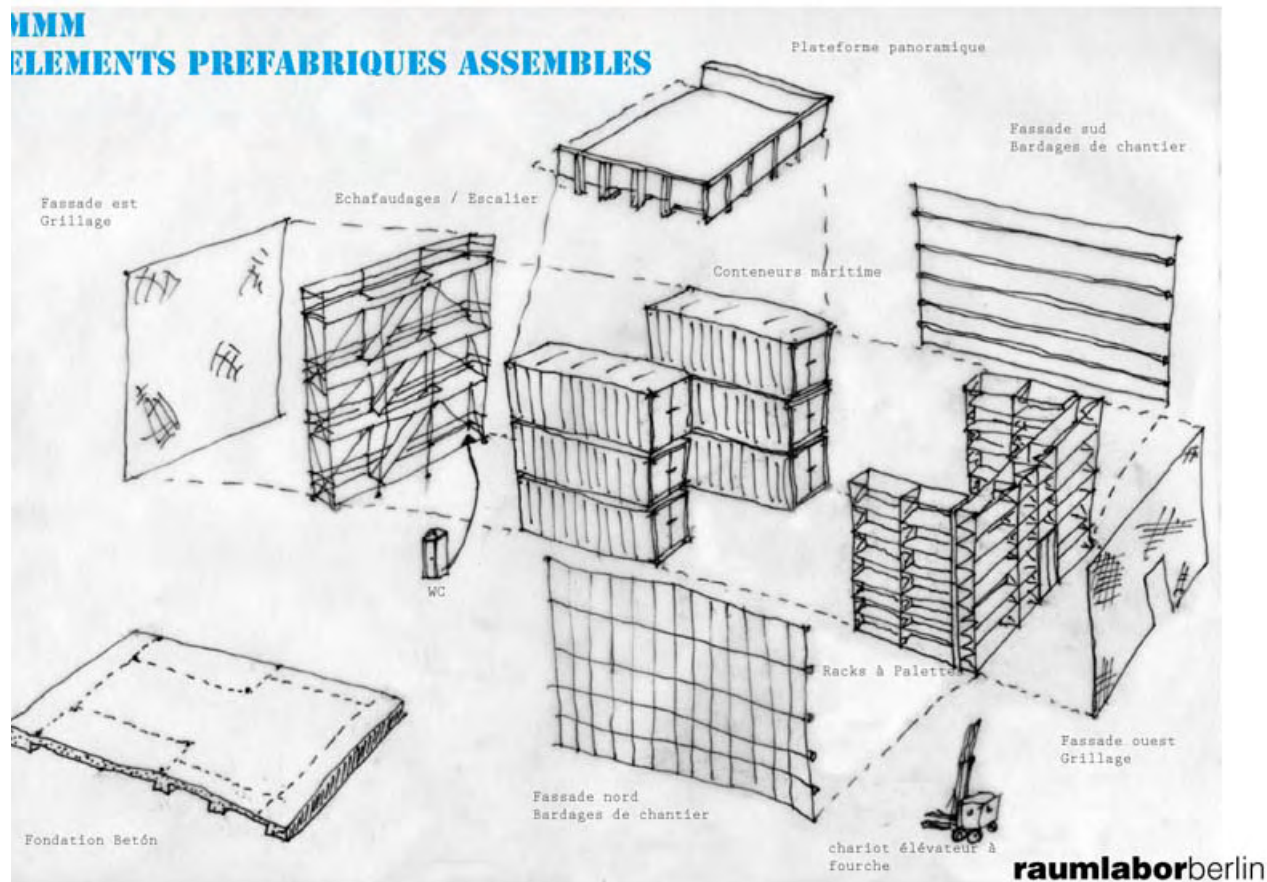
ZAC du Plateau, Ivry-sur-Seine, building site
